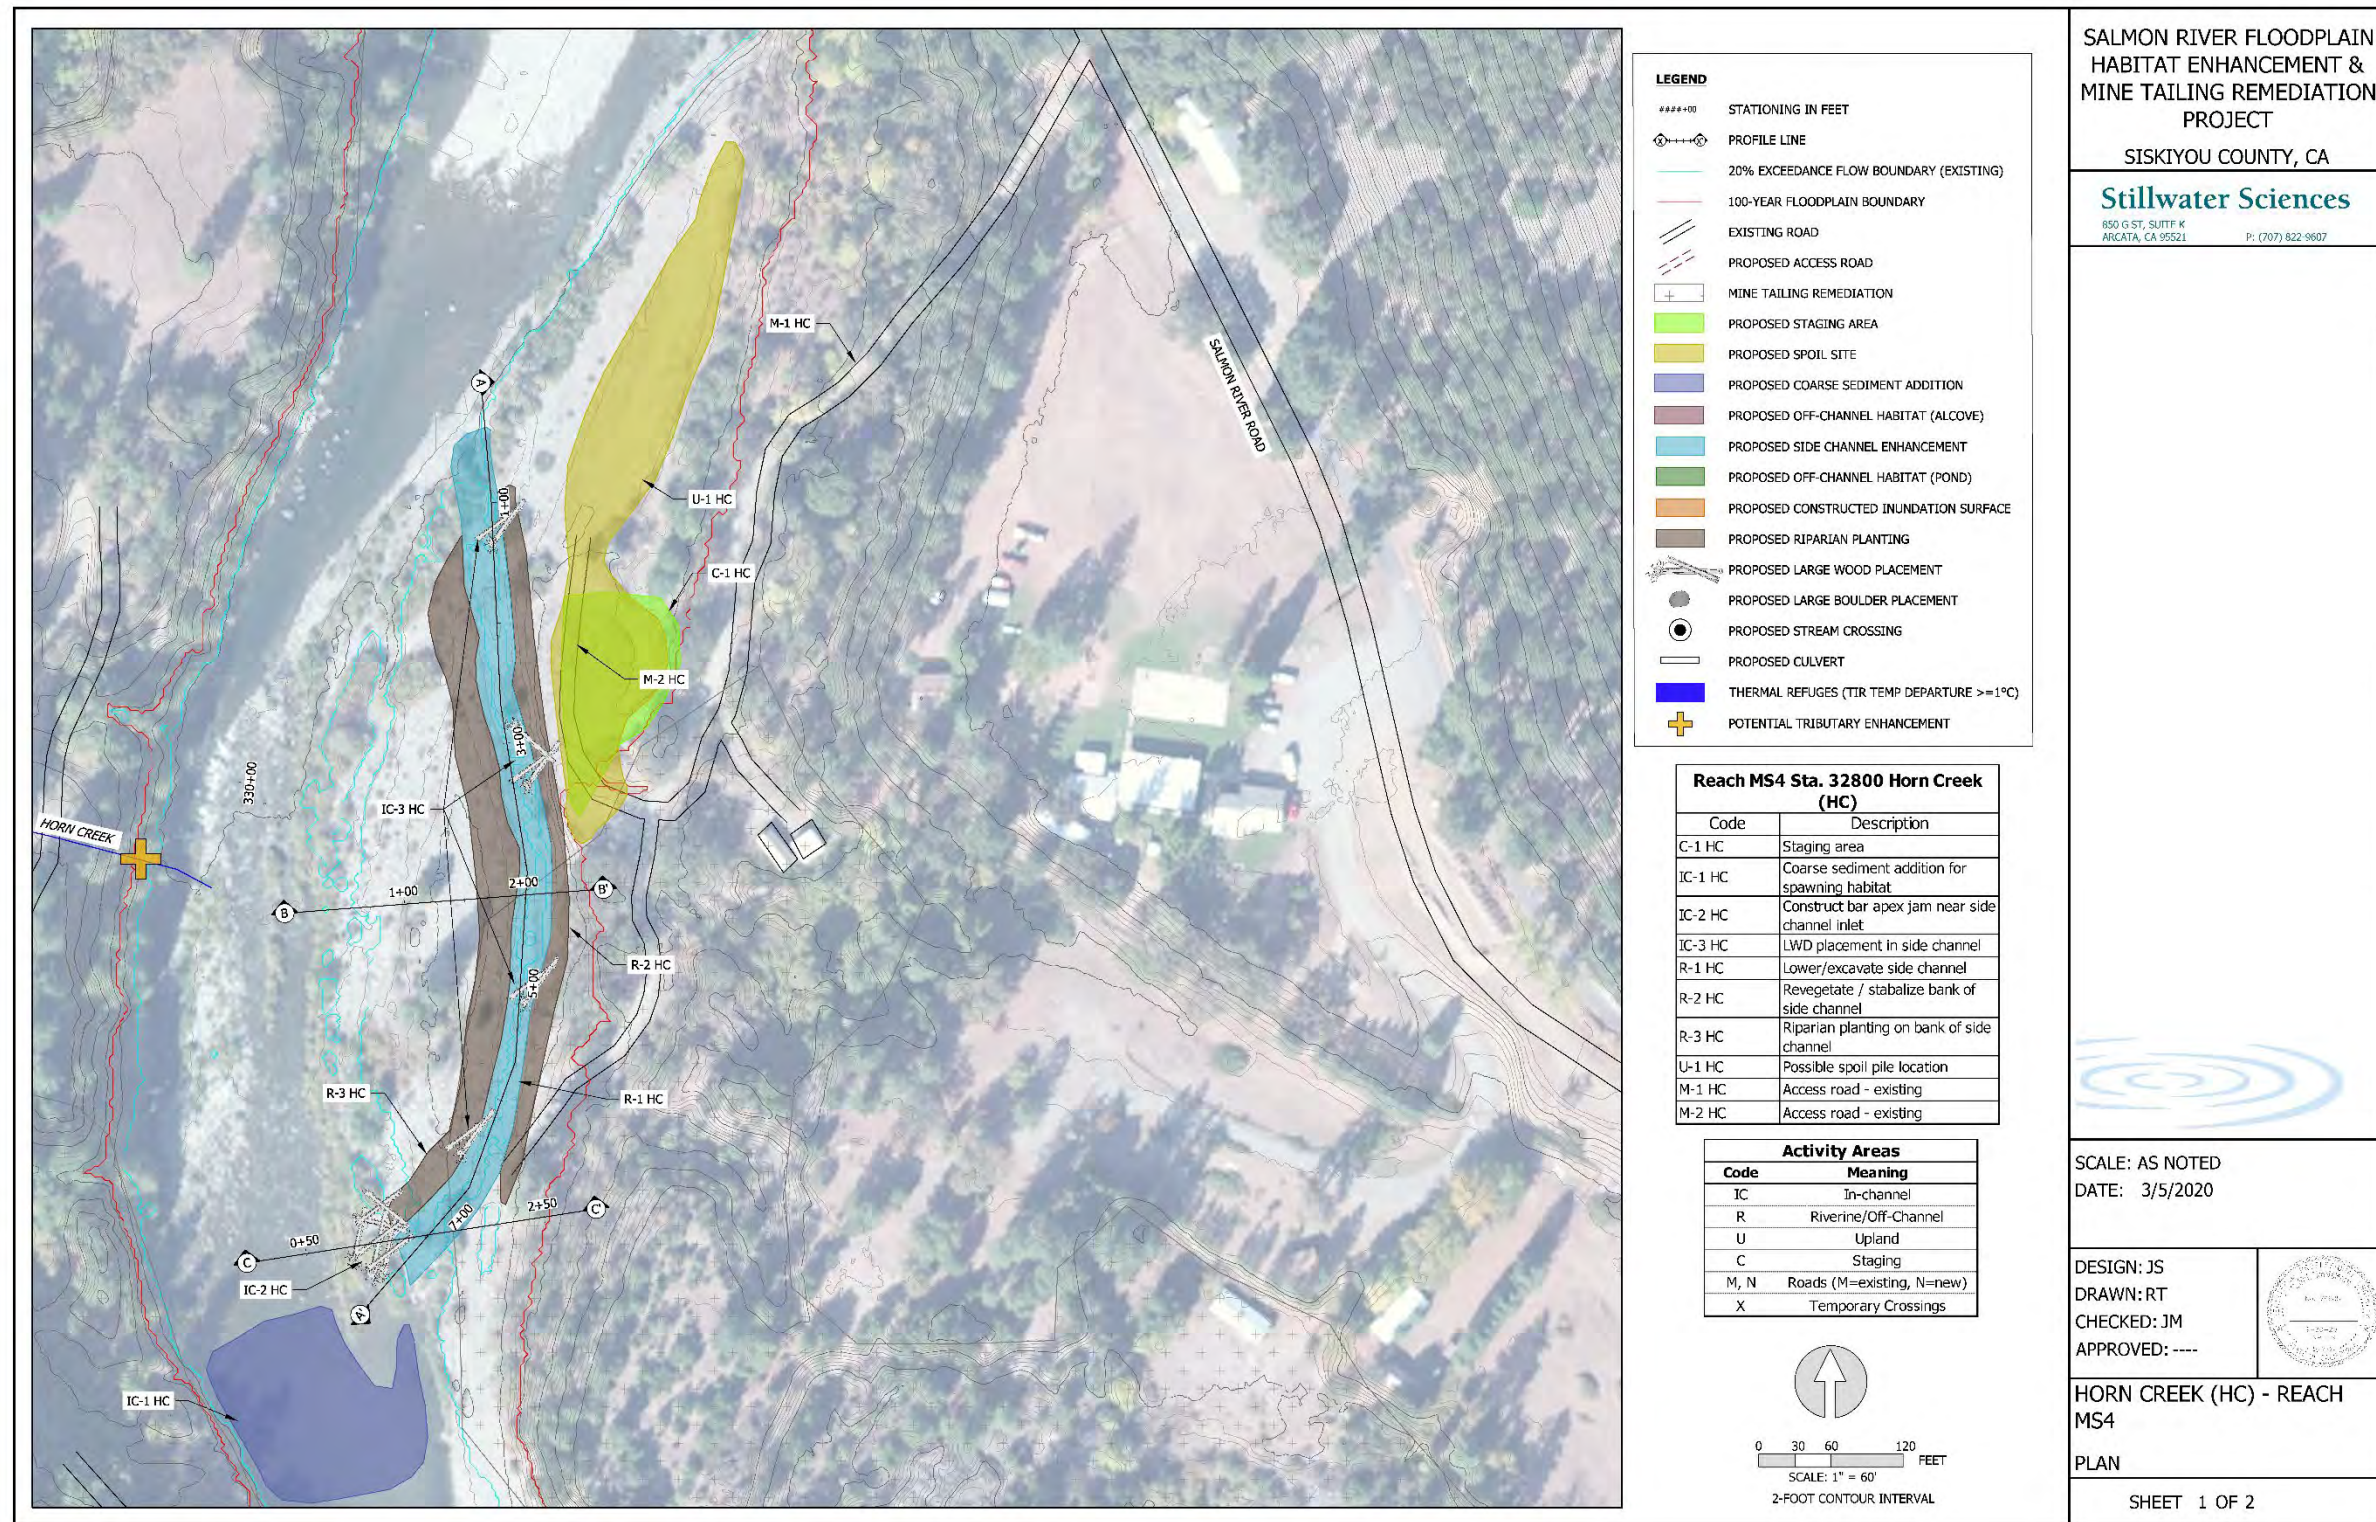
Design plan for Mainstem Reach 4 at Horn Creek.
